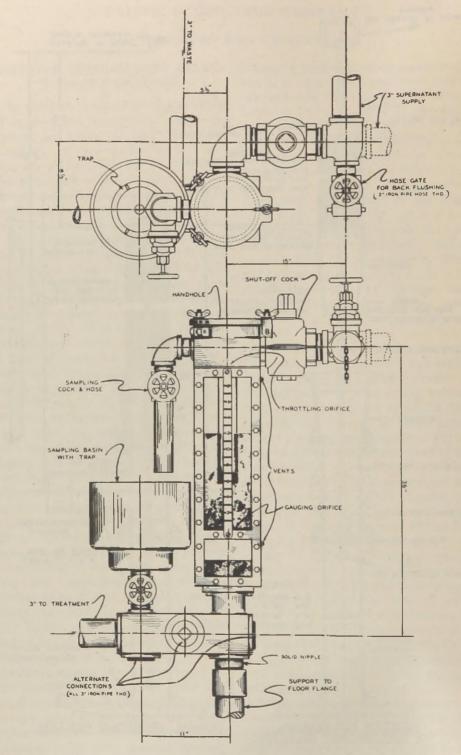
Details of supernatant gauge, sight-glass and sampler.
